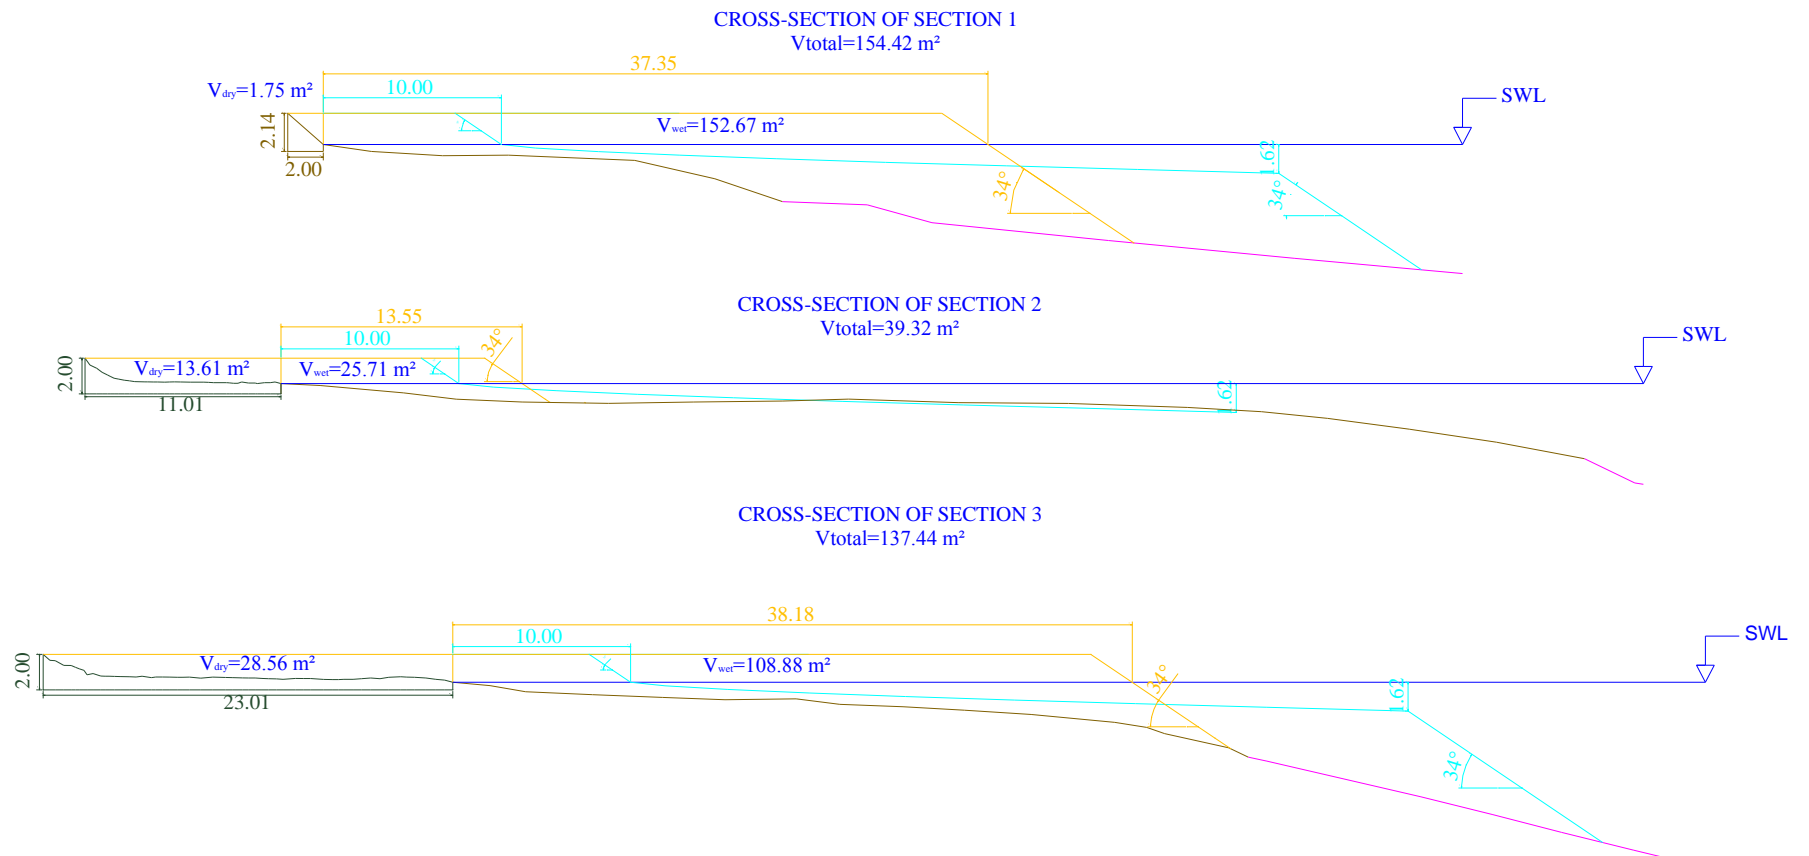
Design profiles of Section 1,2 and 3 for 10 m new dry beach width ($D_{fill} = 0.32 \text{ mm}$).
